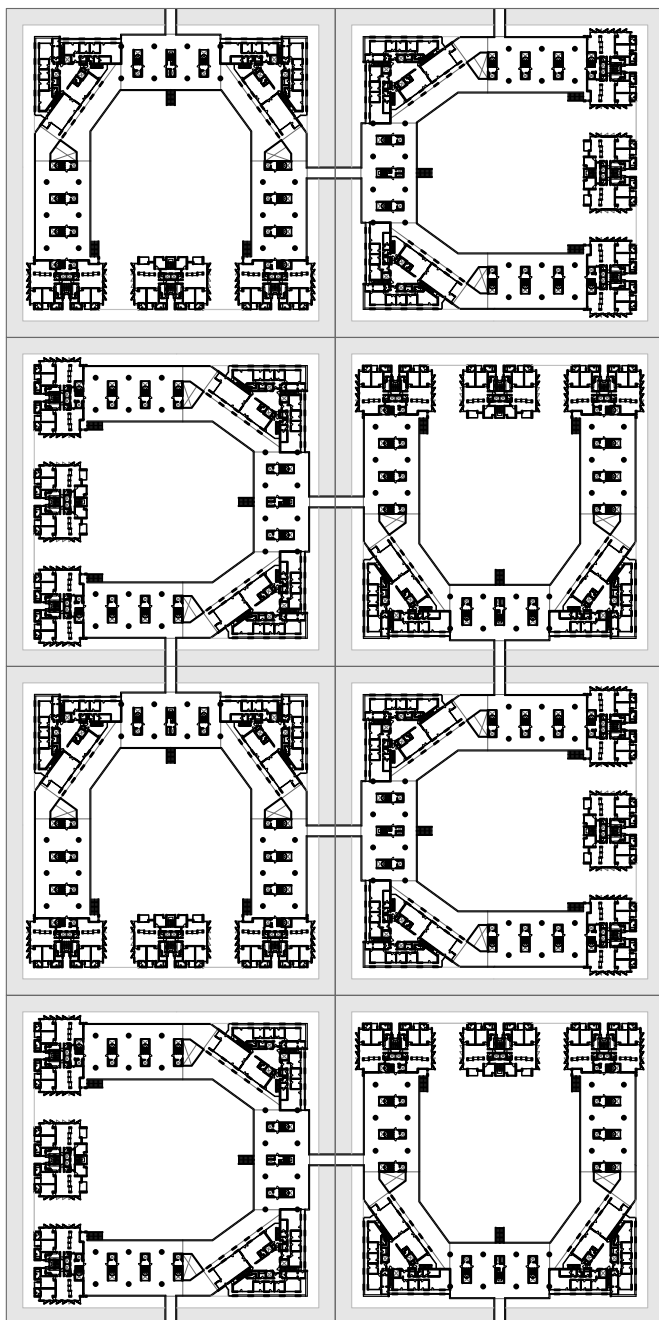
Interconnectivity of ha city blocks on platform level in plan
